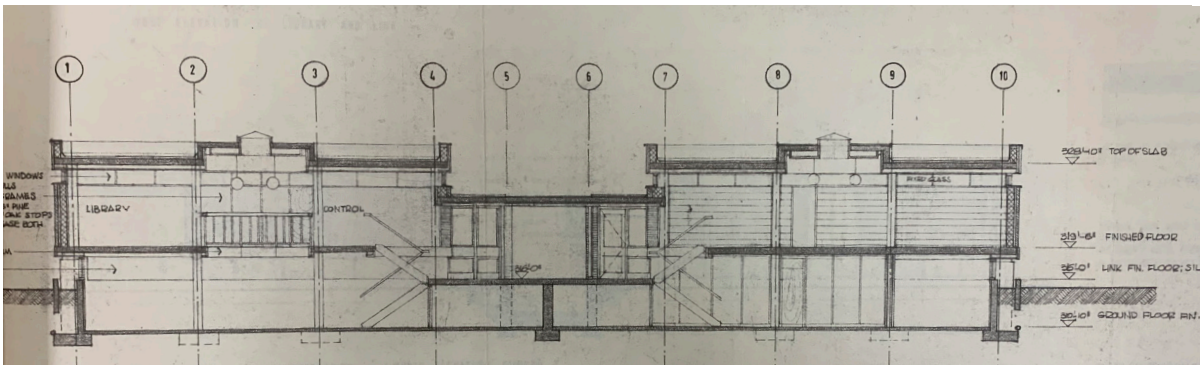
Buildings H & I, section through buildings and link volume (T. V. Murray, 1964).
